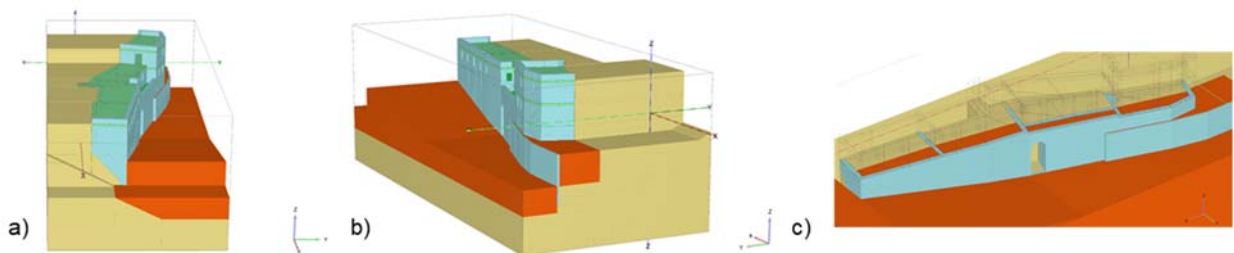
FEM model details: a) western view, b) eastern view and c) construction stage I of the building.
